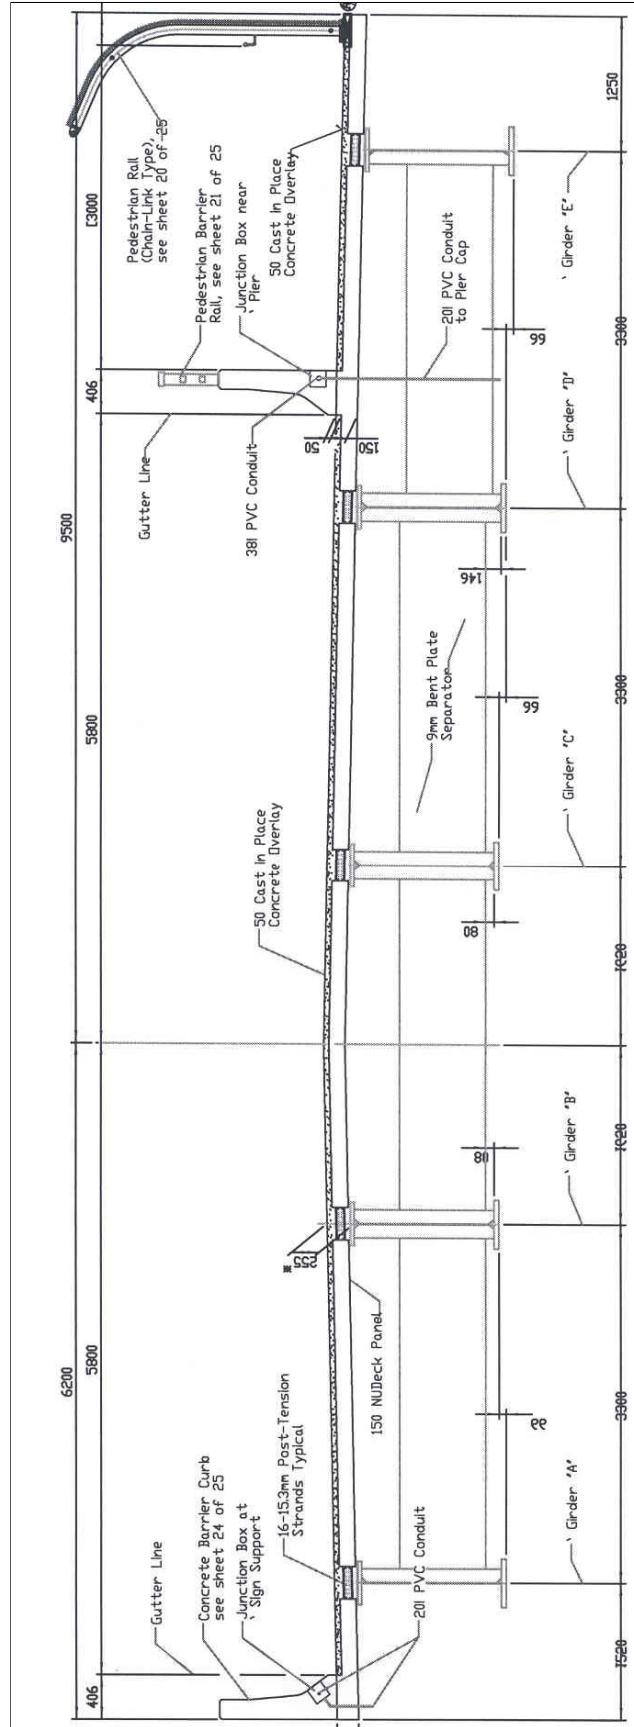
Typical roadway cross section for the Skyline Bridge (NDOR, 2002)
